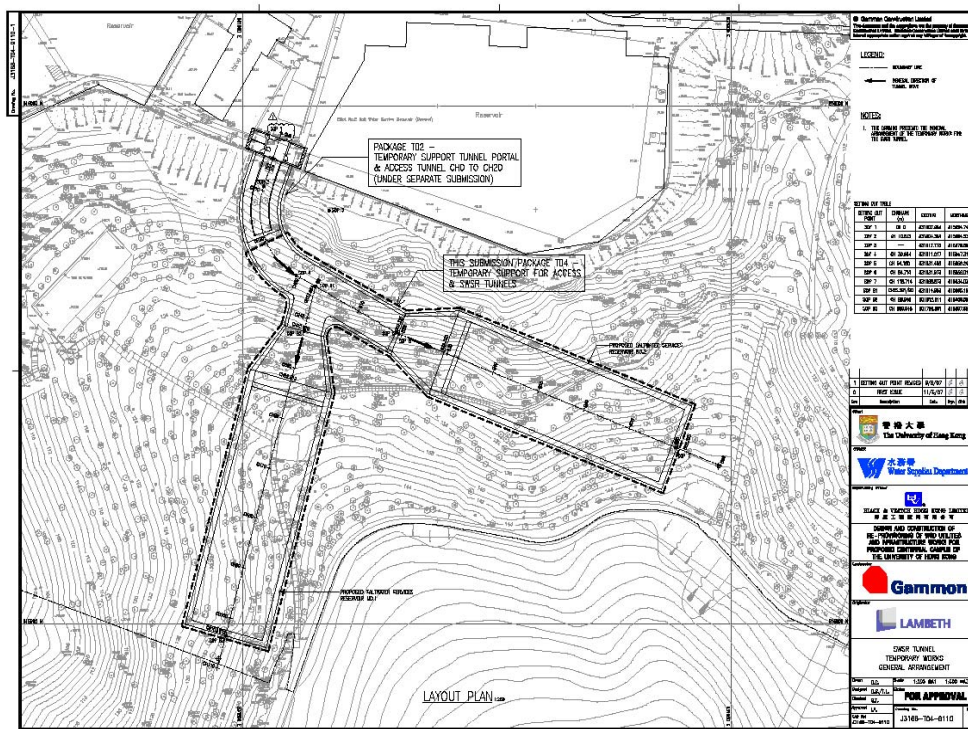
Salt water reservoir tunnel (SWSR) layout plan
